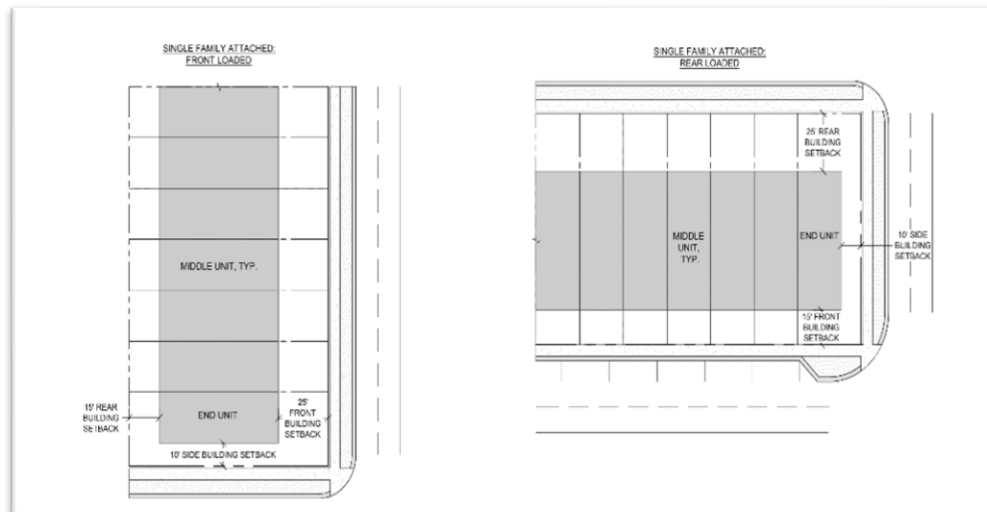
Showing building setback spacing for single family attached (townhomes)
